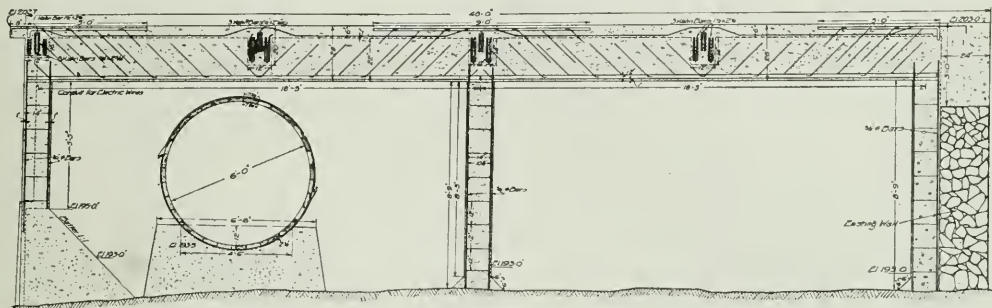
Cross-section of Park Terrace and Pipe Line.
